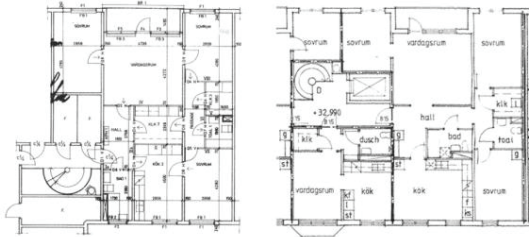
Floor plans showing the layout of a three-bedroom apartment in Norra Bergsjön (left) and Olivedal (right).
